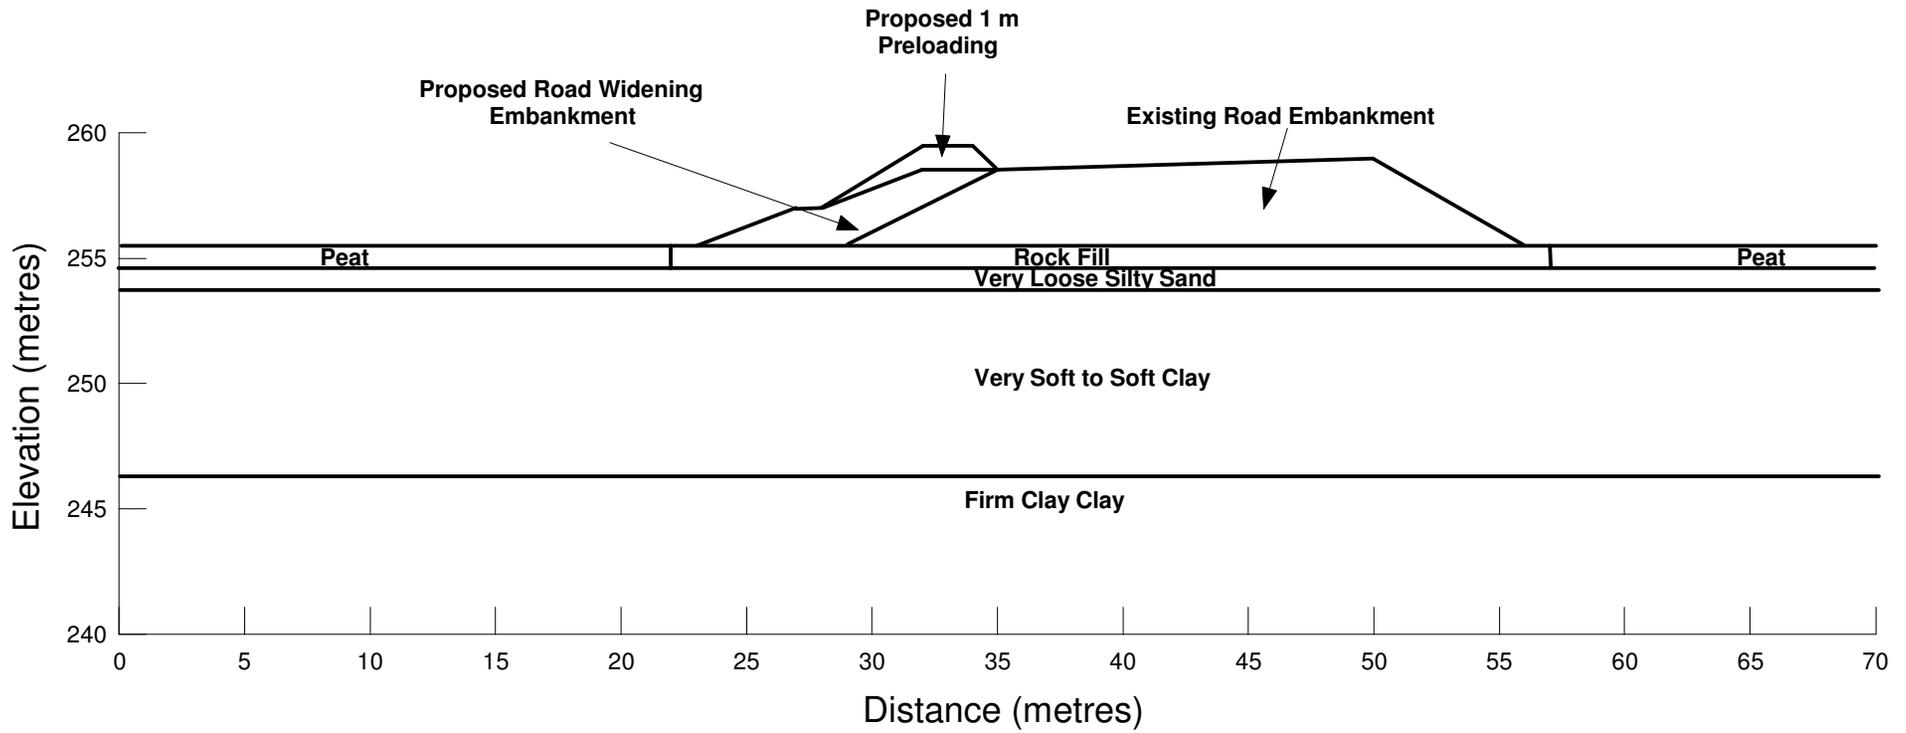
Embankment Configuration and Soil Profiles - Road Widening with 1 m Preloading at Station 19+100
